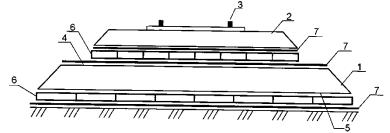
Structure of reinforcement of the railroad's foundation with plastic geocells
